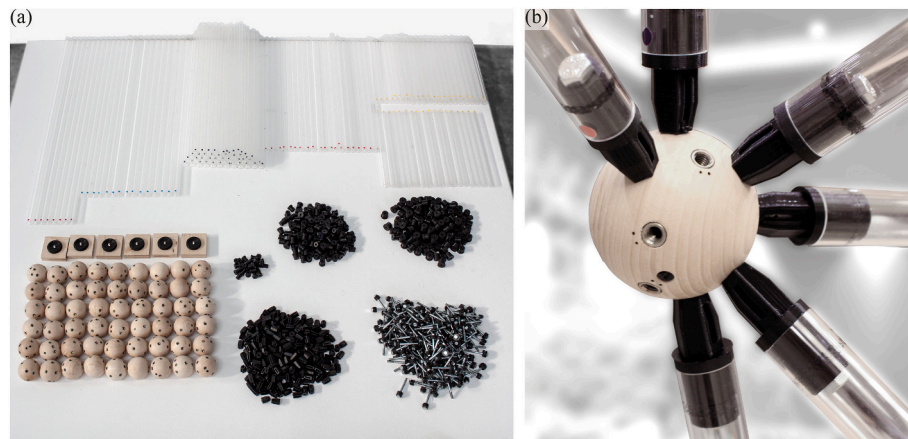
Fabricated parts. (a) complete kit of parts to build the three pavilion structures: tubular bars (transparent acrylic tubes), spherical joints, 3d printed connectors, bolts, and support sockets, (b) detail of a wooden spherical joint with connected tubular bars. Free holes are used to connect members of the other two structures.
